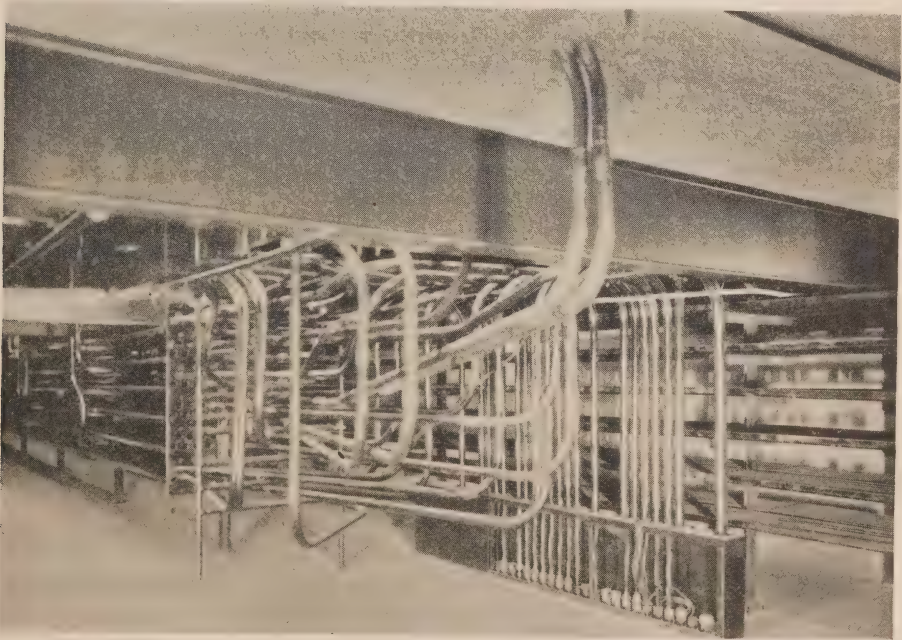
Control Cable Pans and Conduit Risers, No. 2 Unit.
